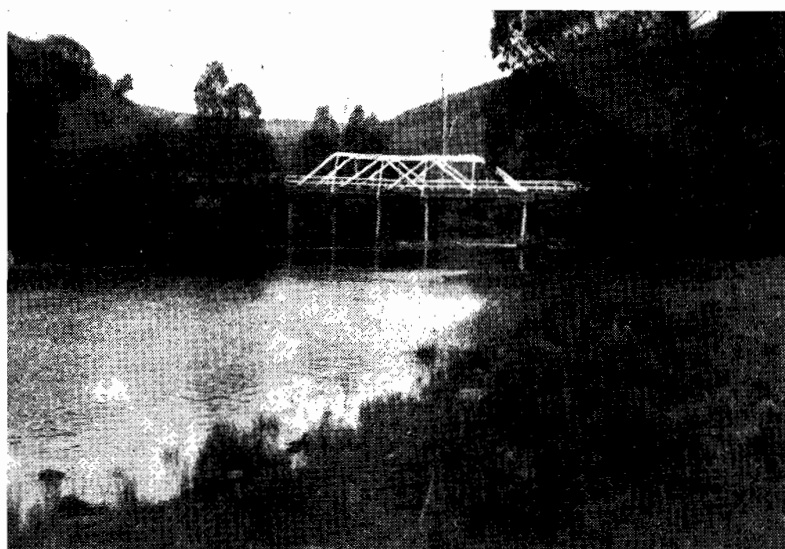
Maffra Shire—Licola Road.—McAllister River Bridge, showing toms under timber truss.
